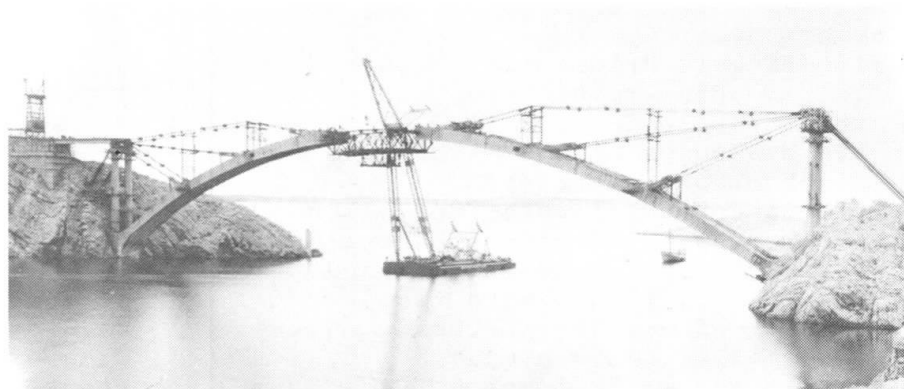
Reinforced concrete arch of Pag Island bridge during construction
